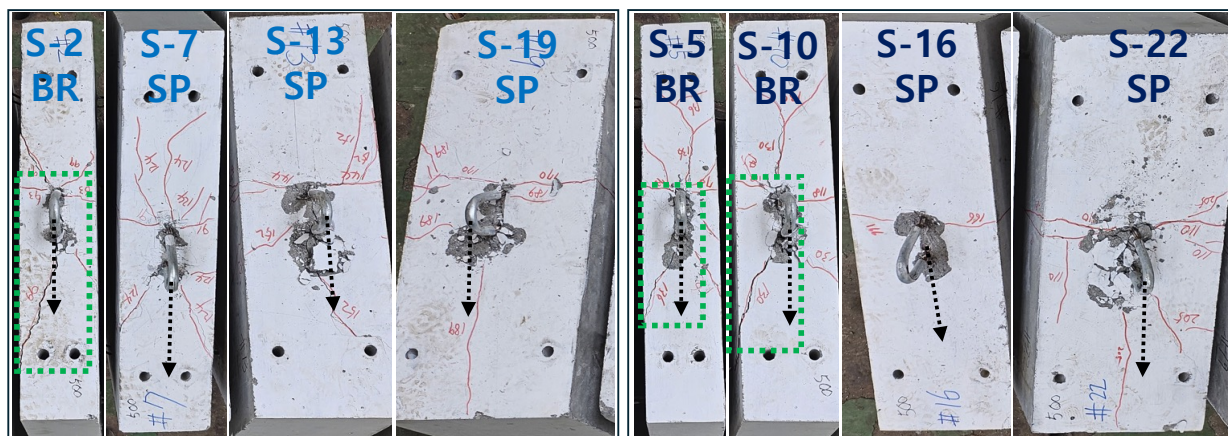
Failure modes (embedment depth of 250 mm). BR = breakout failure of the concrete; S-2 = specimen 2; S-5 = specimen 5; S-7 = specimen 7; S-10 = specimen 10; S-13 = specimen 13; S-16 = specimen 16; S-19 = specimen 19; S-22 = specimen 22; SP = splitting rupture of the concrete. Note: 1 mm = 0.0394 in.
